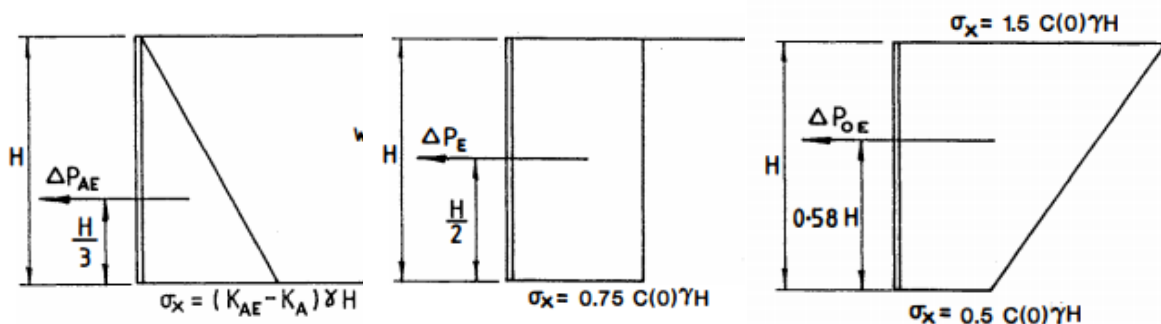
Earth pressures on retaining walls (L-R flexible – stiff – rigid walls) (after Wood and Elms, 1990)
